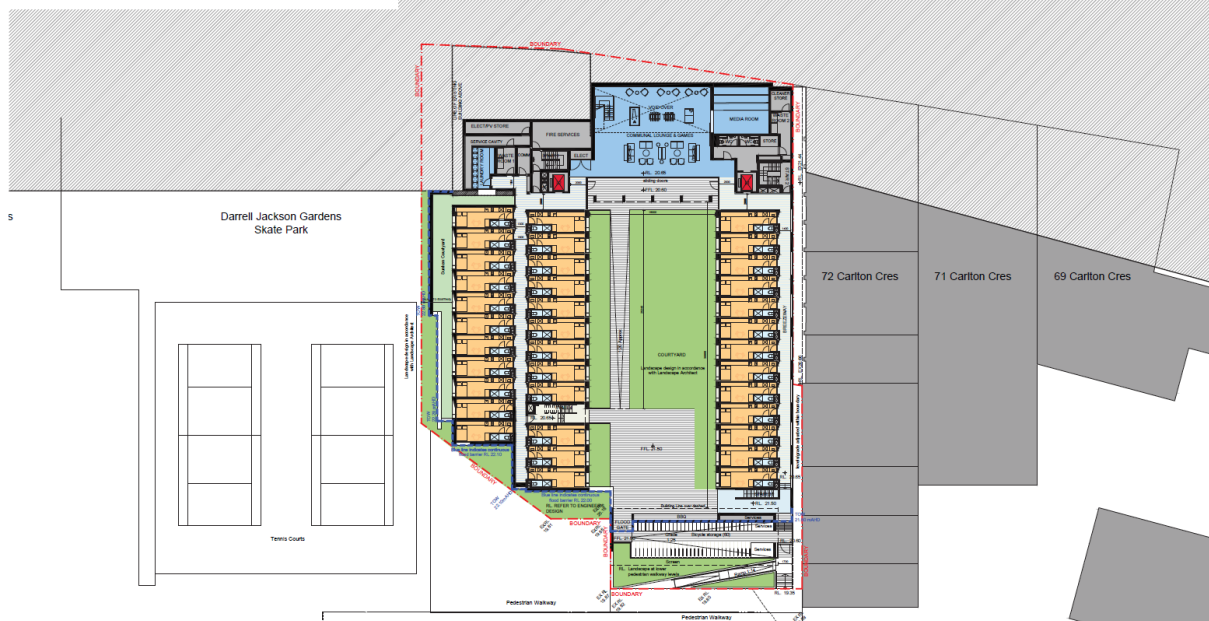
Revised lower ground floor plan detailing the creation of the new flood wall along the western boundary
